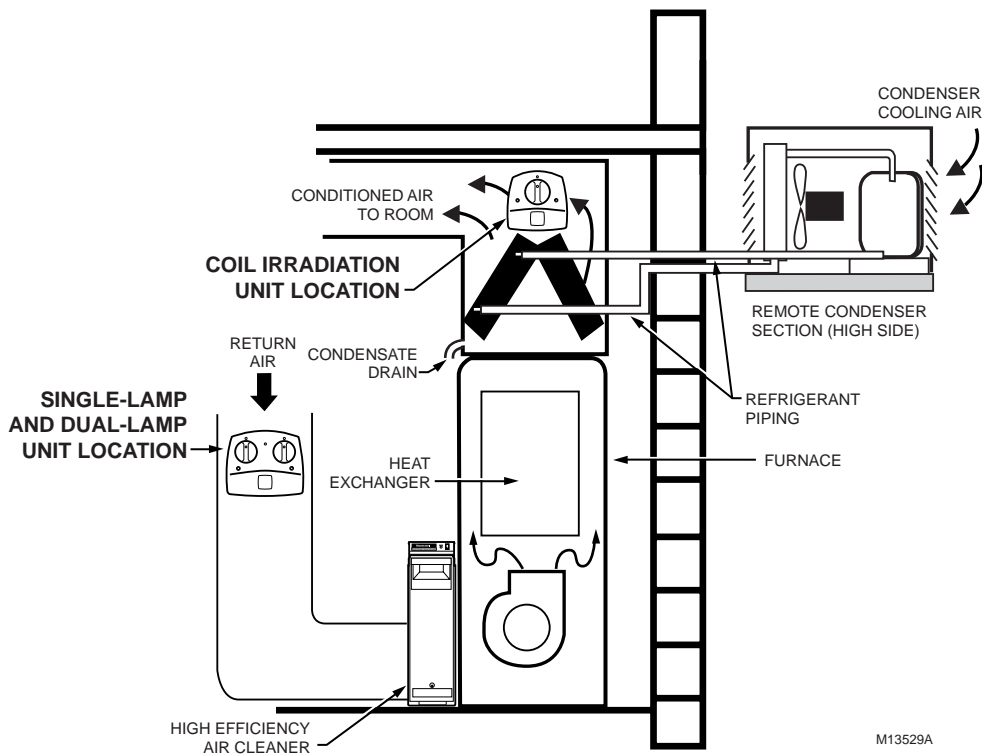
Possible mounting locations for Ultraviolet Air Treatment Systems.
